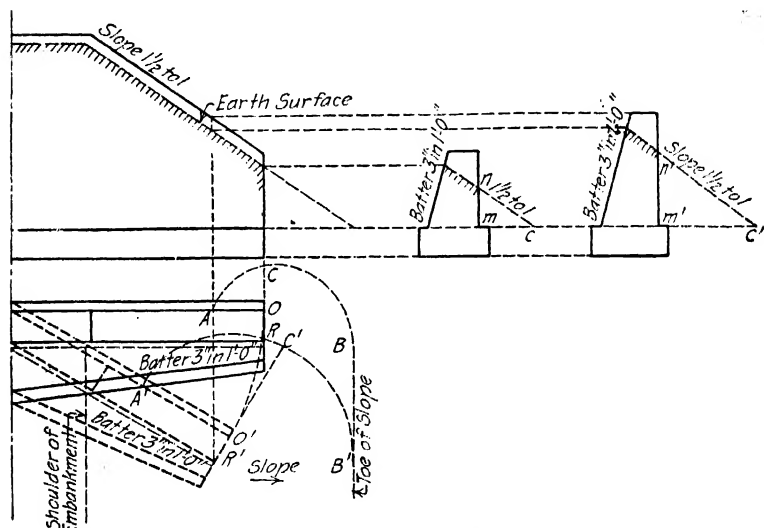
Disposition of the earth slopes at the end of a wing wall.
